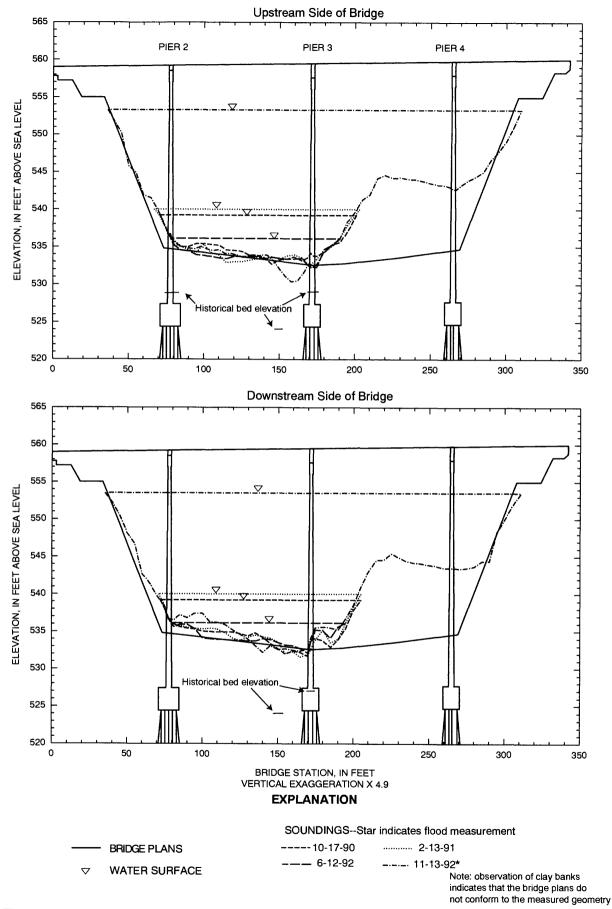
Cross sections showing bed elevations from bridge plans and soundings, State Road 59 over Eel River north of Clay City, Indiana.
